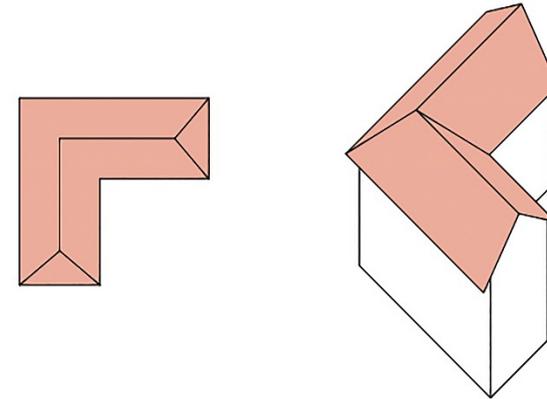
Pitched roofs for direction of water on both sides of the building
